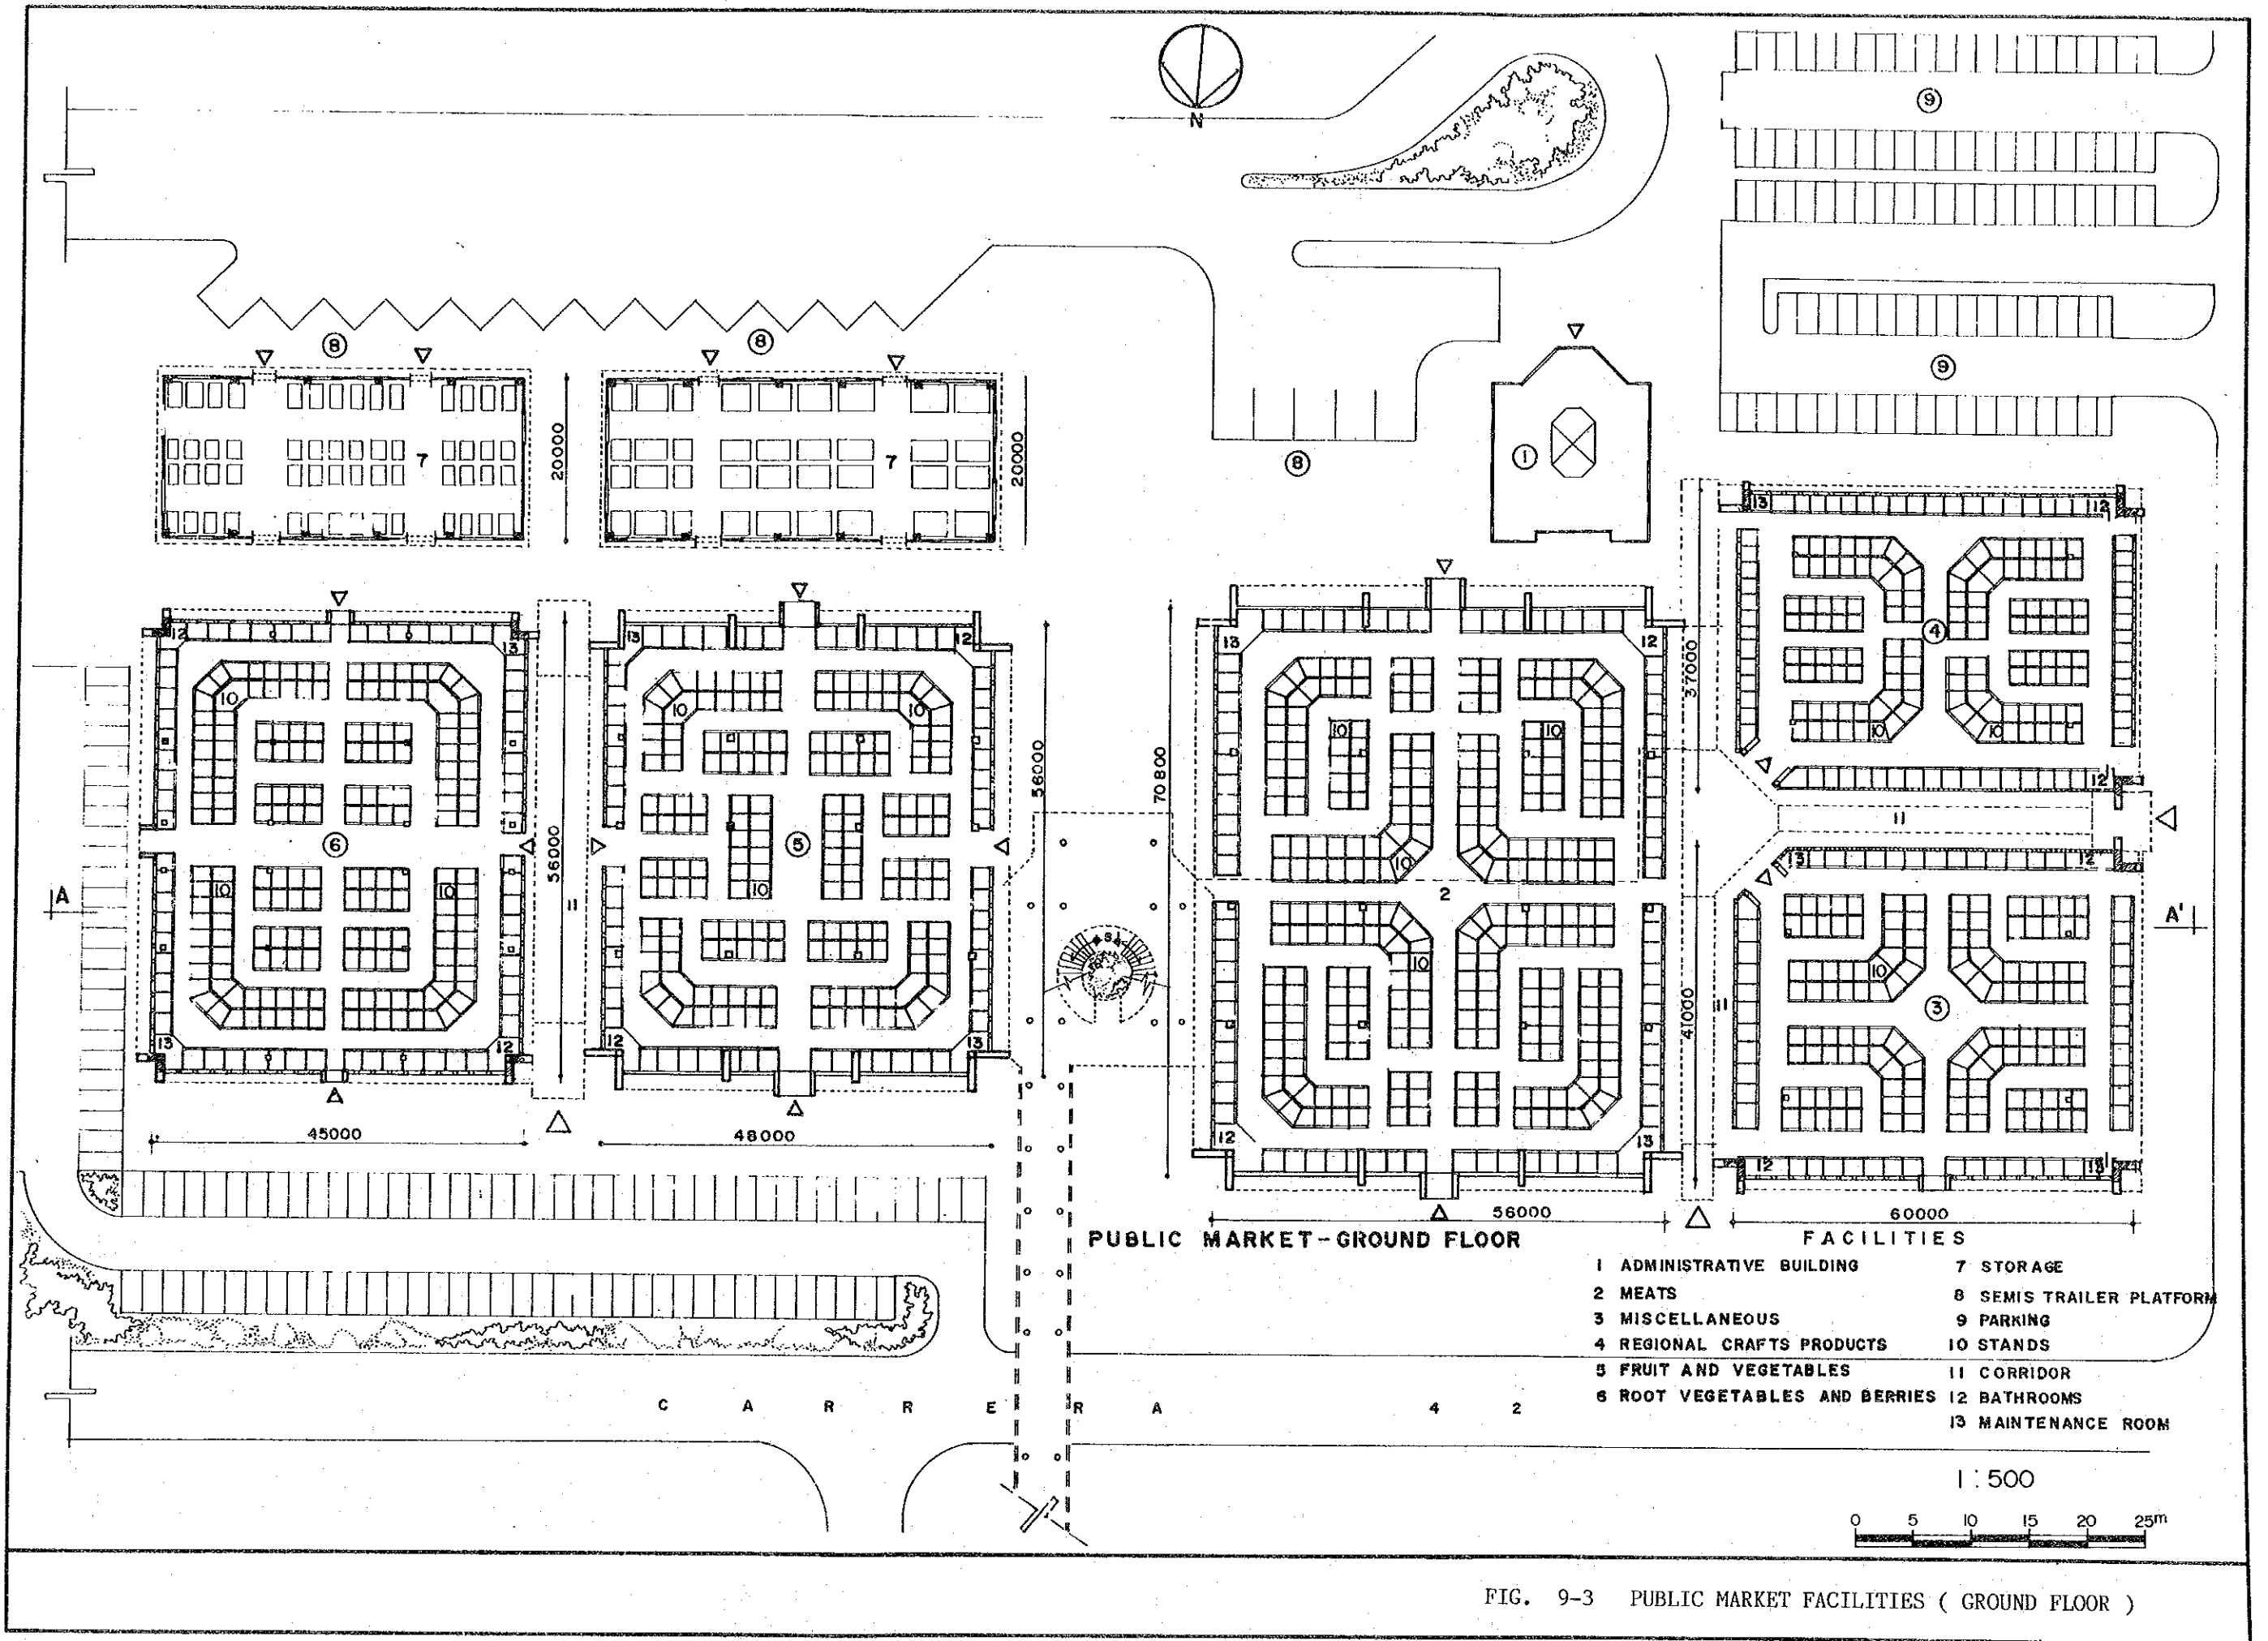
PUBLIC MARKET FACILITIES (GROUND FLOOR)
